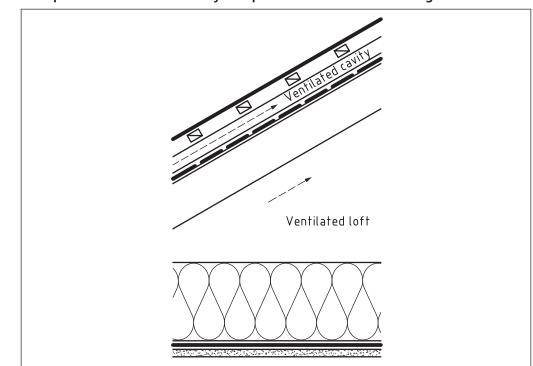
Cold pitched roof – LR underlay – Impermeable external covering
